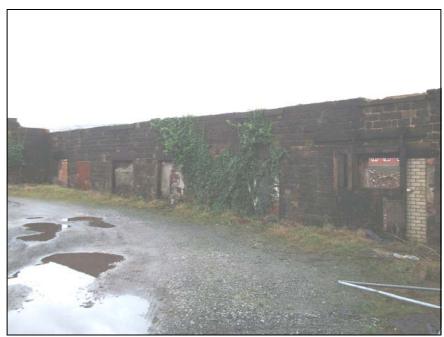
, 55: view of the external wall of the recessed 5 bay, 3 storey building, from the SW
